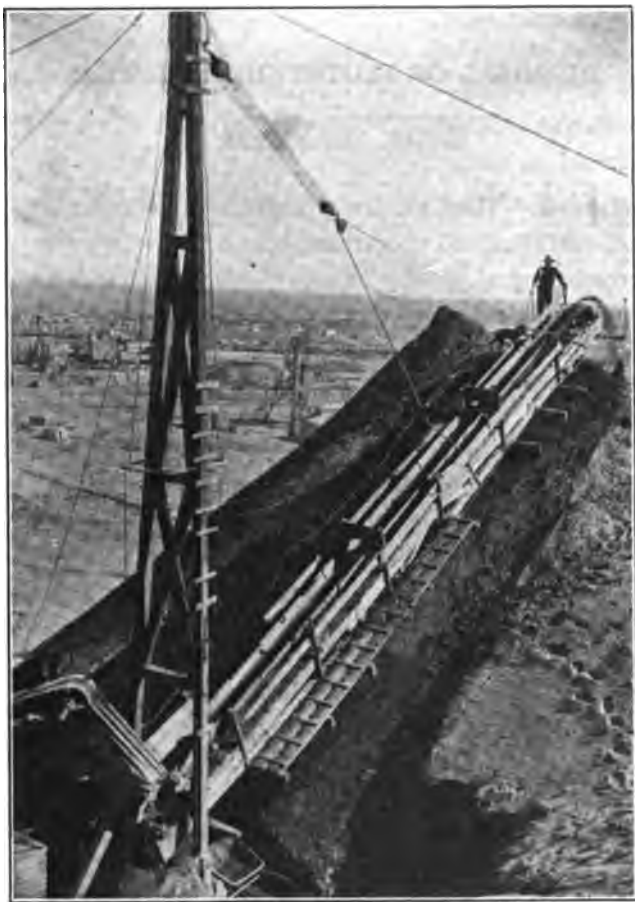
Australian Boom-Distributor. Belt-driven without gear at 900 ft. per min. by slow-speed motor controlled from below. The machine can be moved while working.
